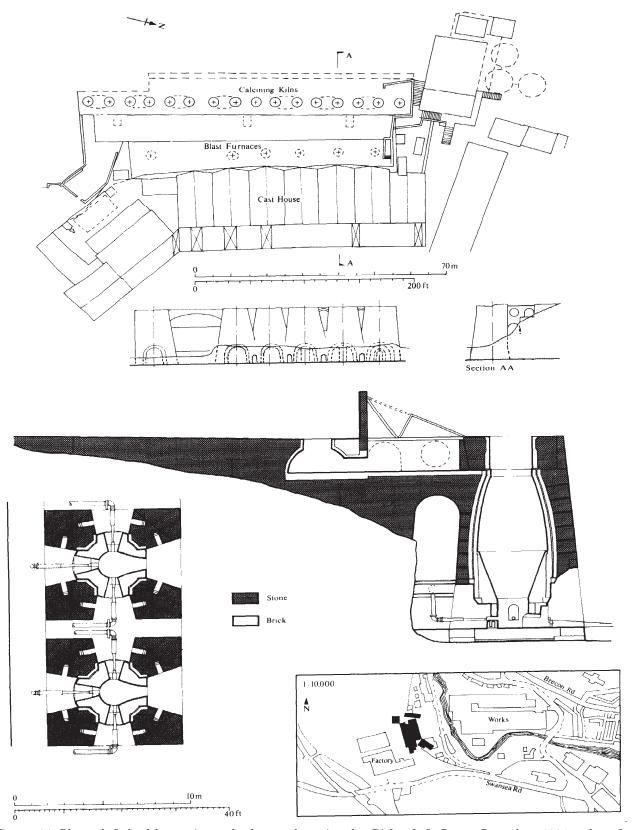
Plan of Cyfarthfa: conjectural plan and section by Richard S Dean, December 1984, adapted with assistance from RCAHM(W). Inset: location plan
